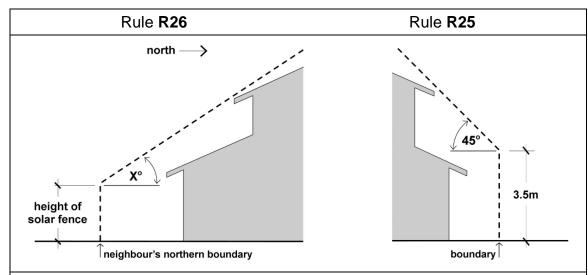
Typical building envelope for rule R25 and solar building envelope for rule R26
